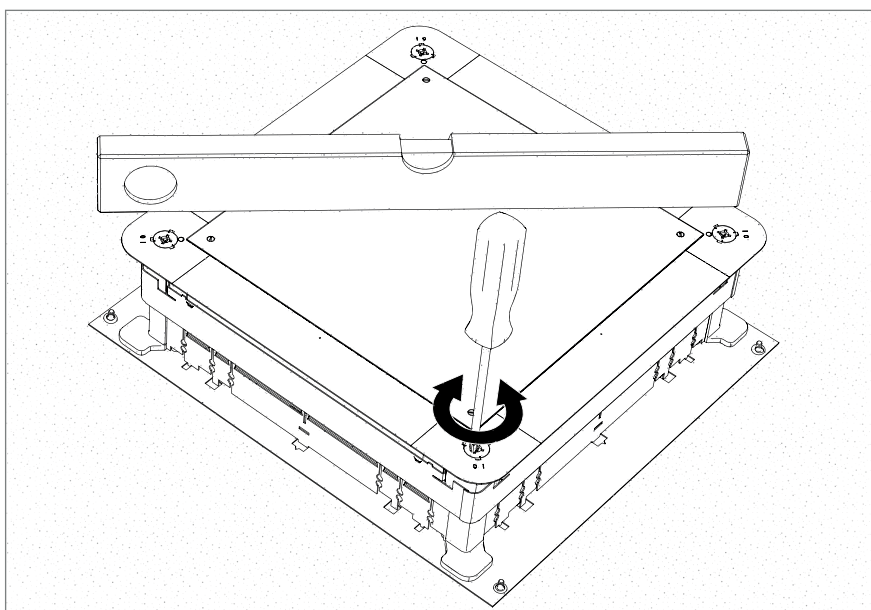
Fine height adjustment of the underfloor junction boxes/underfloor device sockets
